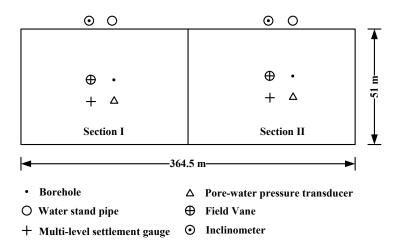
Project site and plan view of instrumentation followed by Chu and Yan 2005
